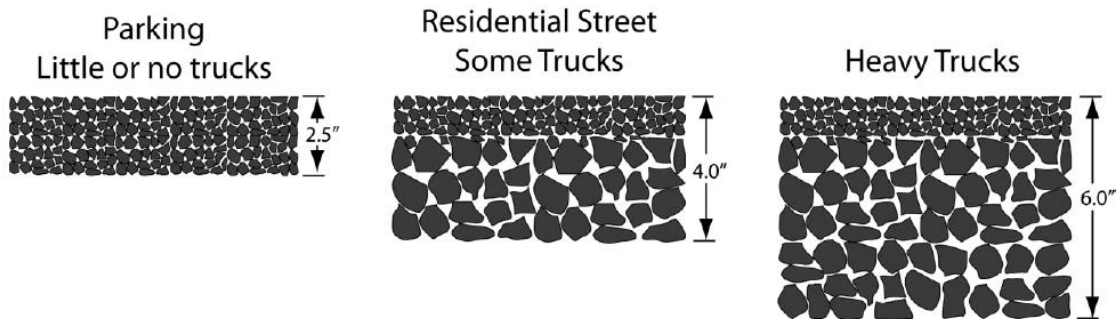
17 : Minimum Recommended Compacted Permeable Bitumen Pavement Thickness
